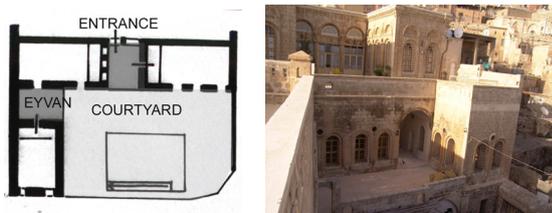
Drawing [10] and photo the house at 113 street no:18 in Mardin.
